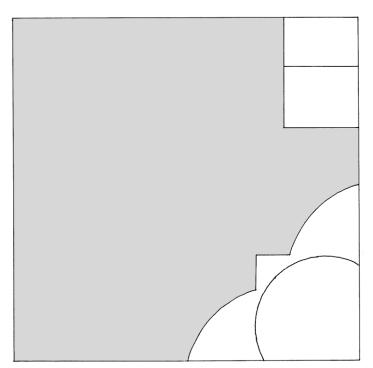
Section through the joist showing the moulding and mortise for a floor joist.
